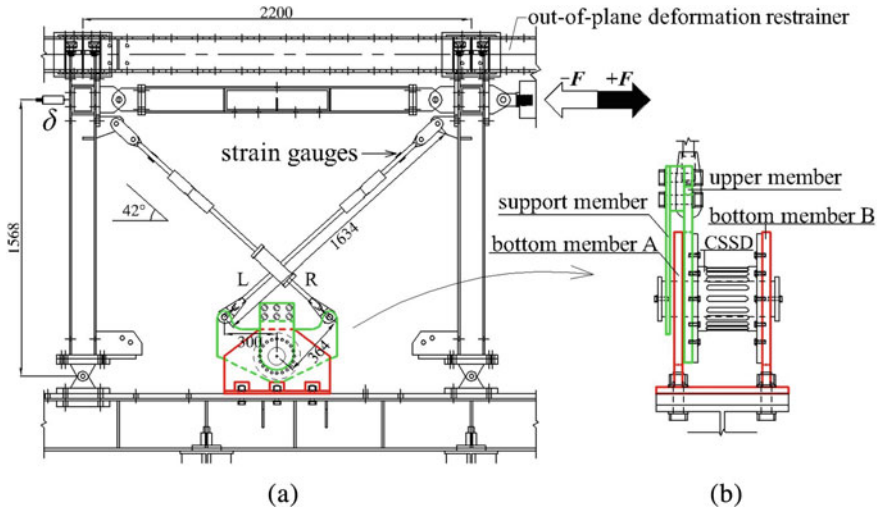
Test arrangement: a elevation; b damper connection details (units: mm)
